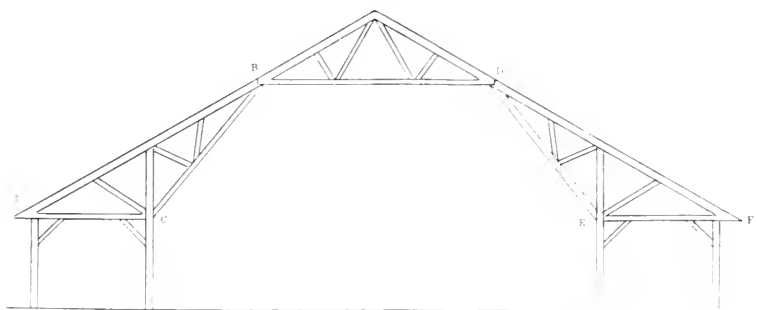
SIMPLE WOODEN CANTILEVER TRUSS.
